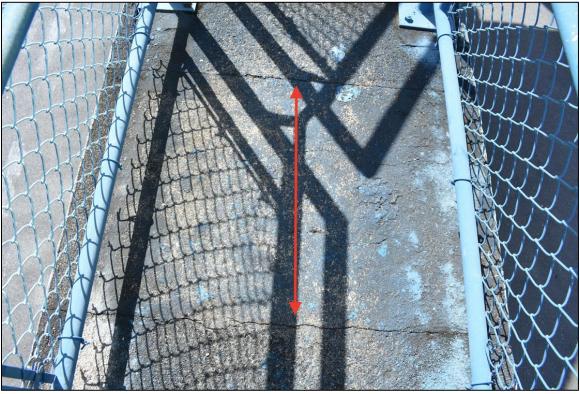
Transversal cracks on deck of PB 1478
